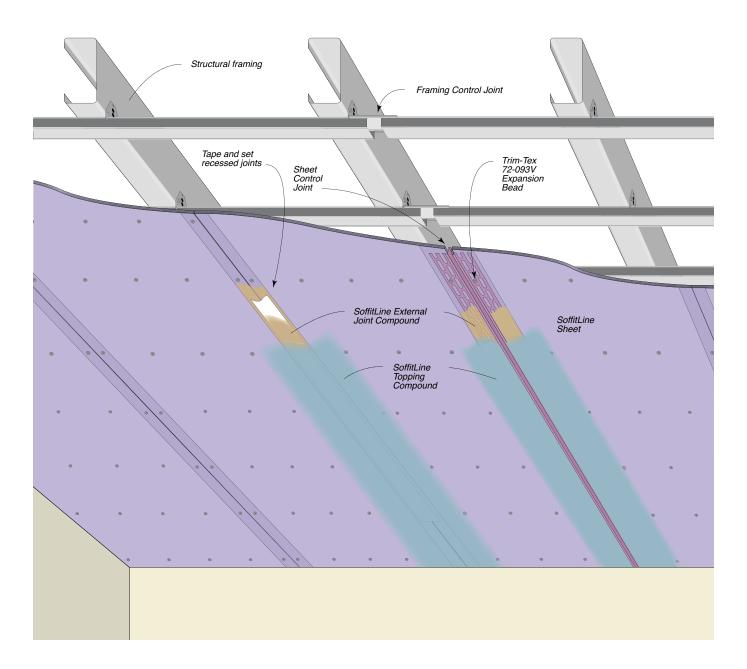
Typical Layout for SoffitLine Ceiling System - External Ceiling with Flush-Set Joints
